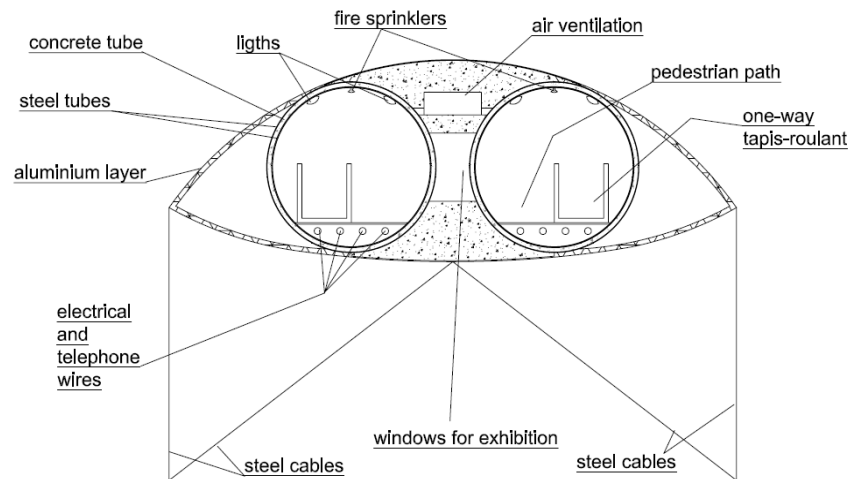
Cross-section of the Archimedes Bridge crossing the Huang Pu river in Shangai (PR of China).
